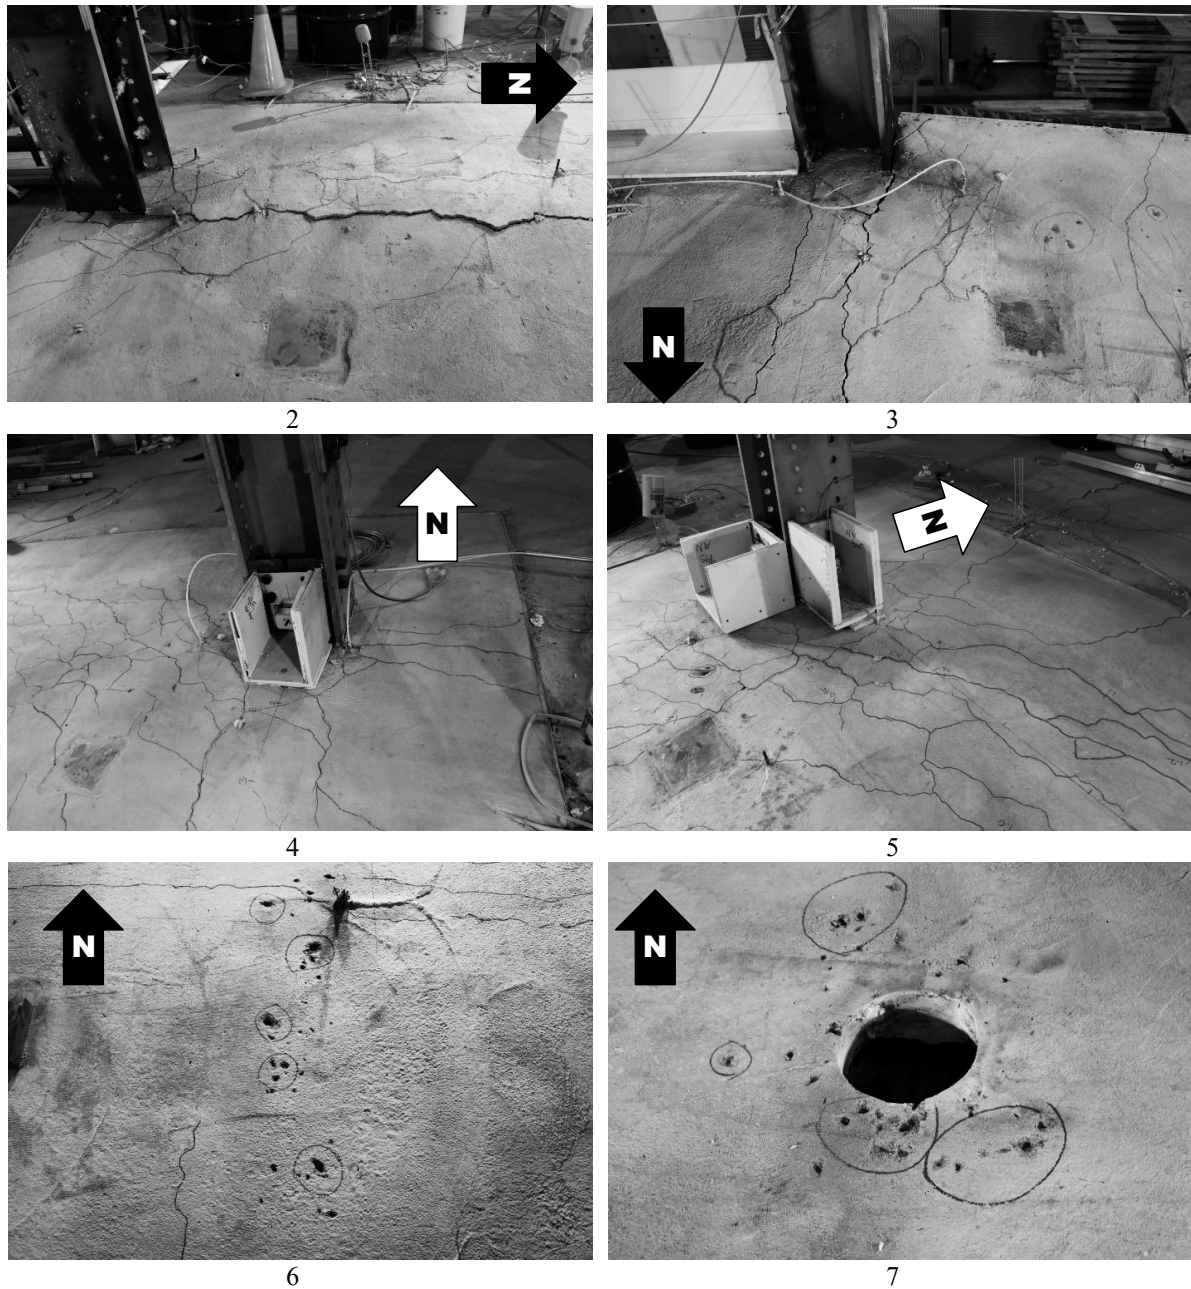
Post-test photographs of the test floor slab, including closeups of concrete damage at locations 2 through 7.
